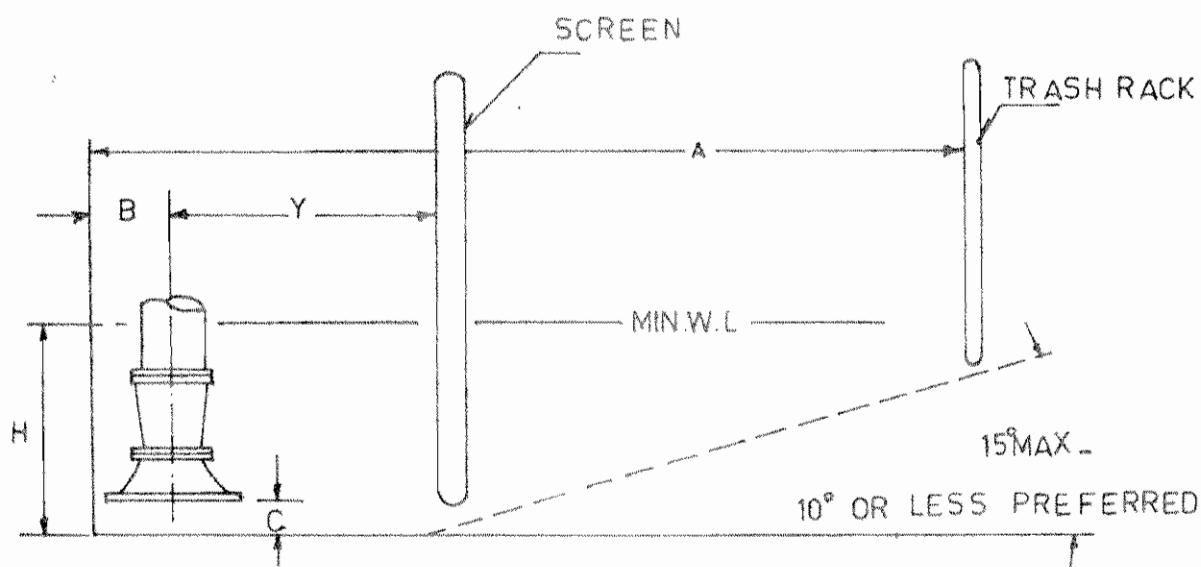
SUMP DIMENSIONS ELEVATION VIEW
